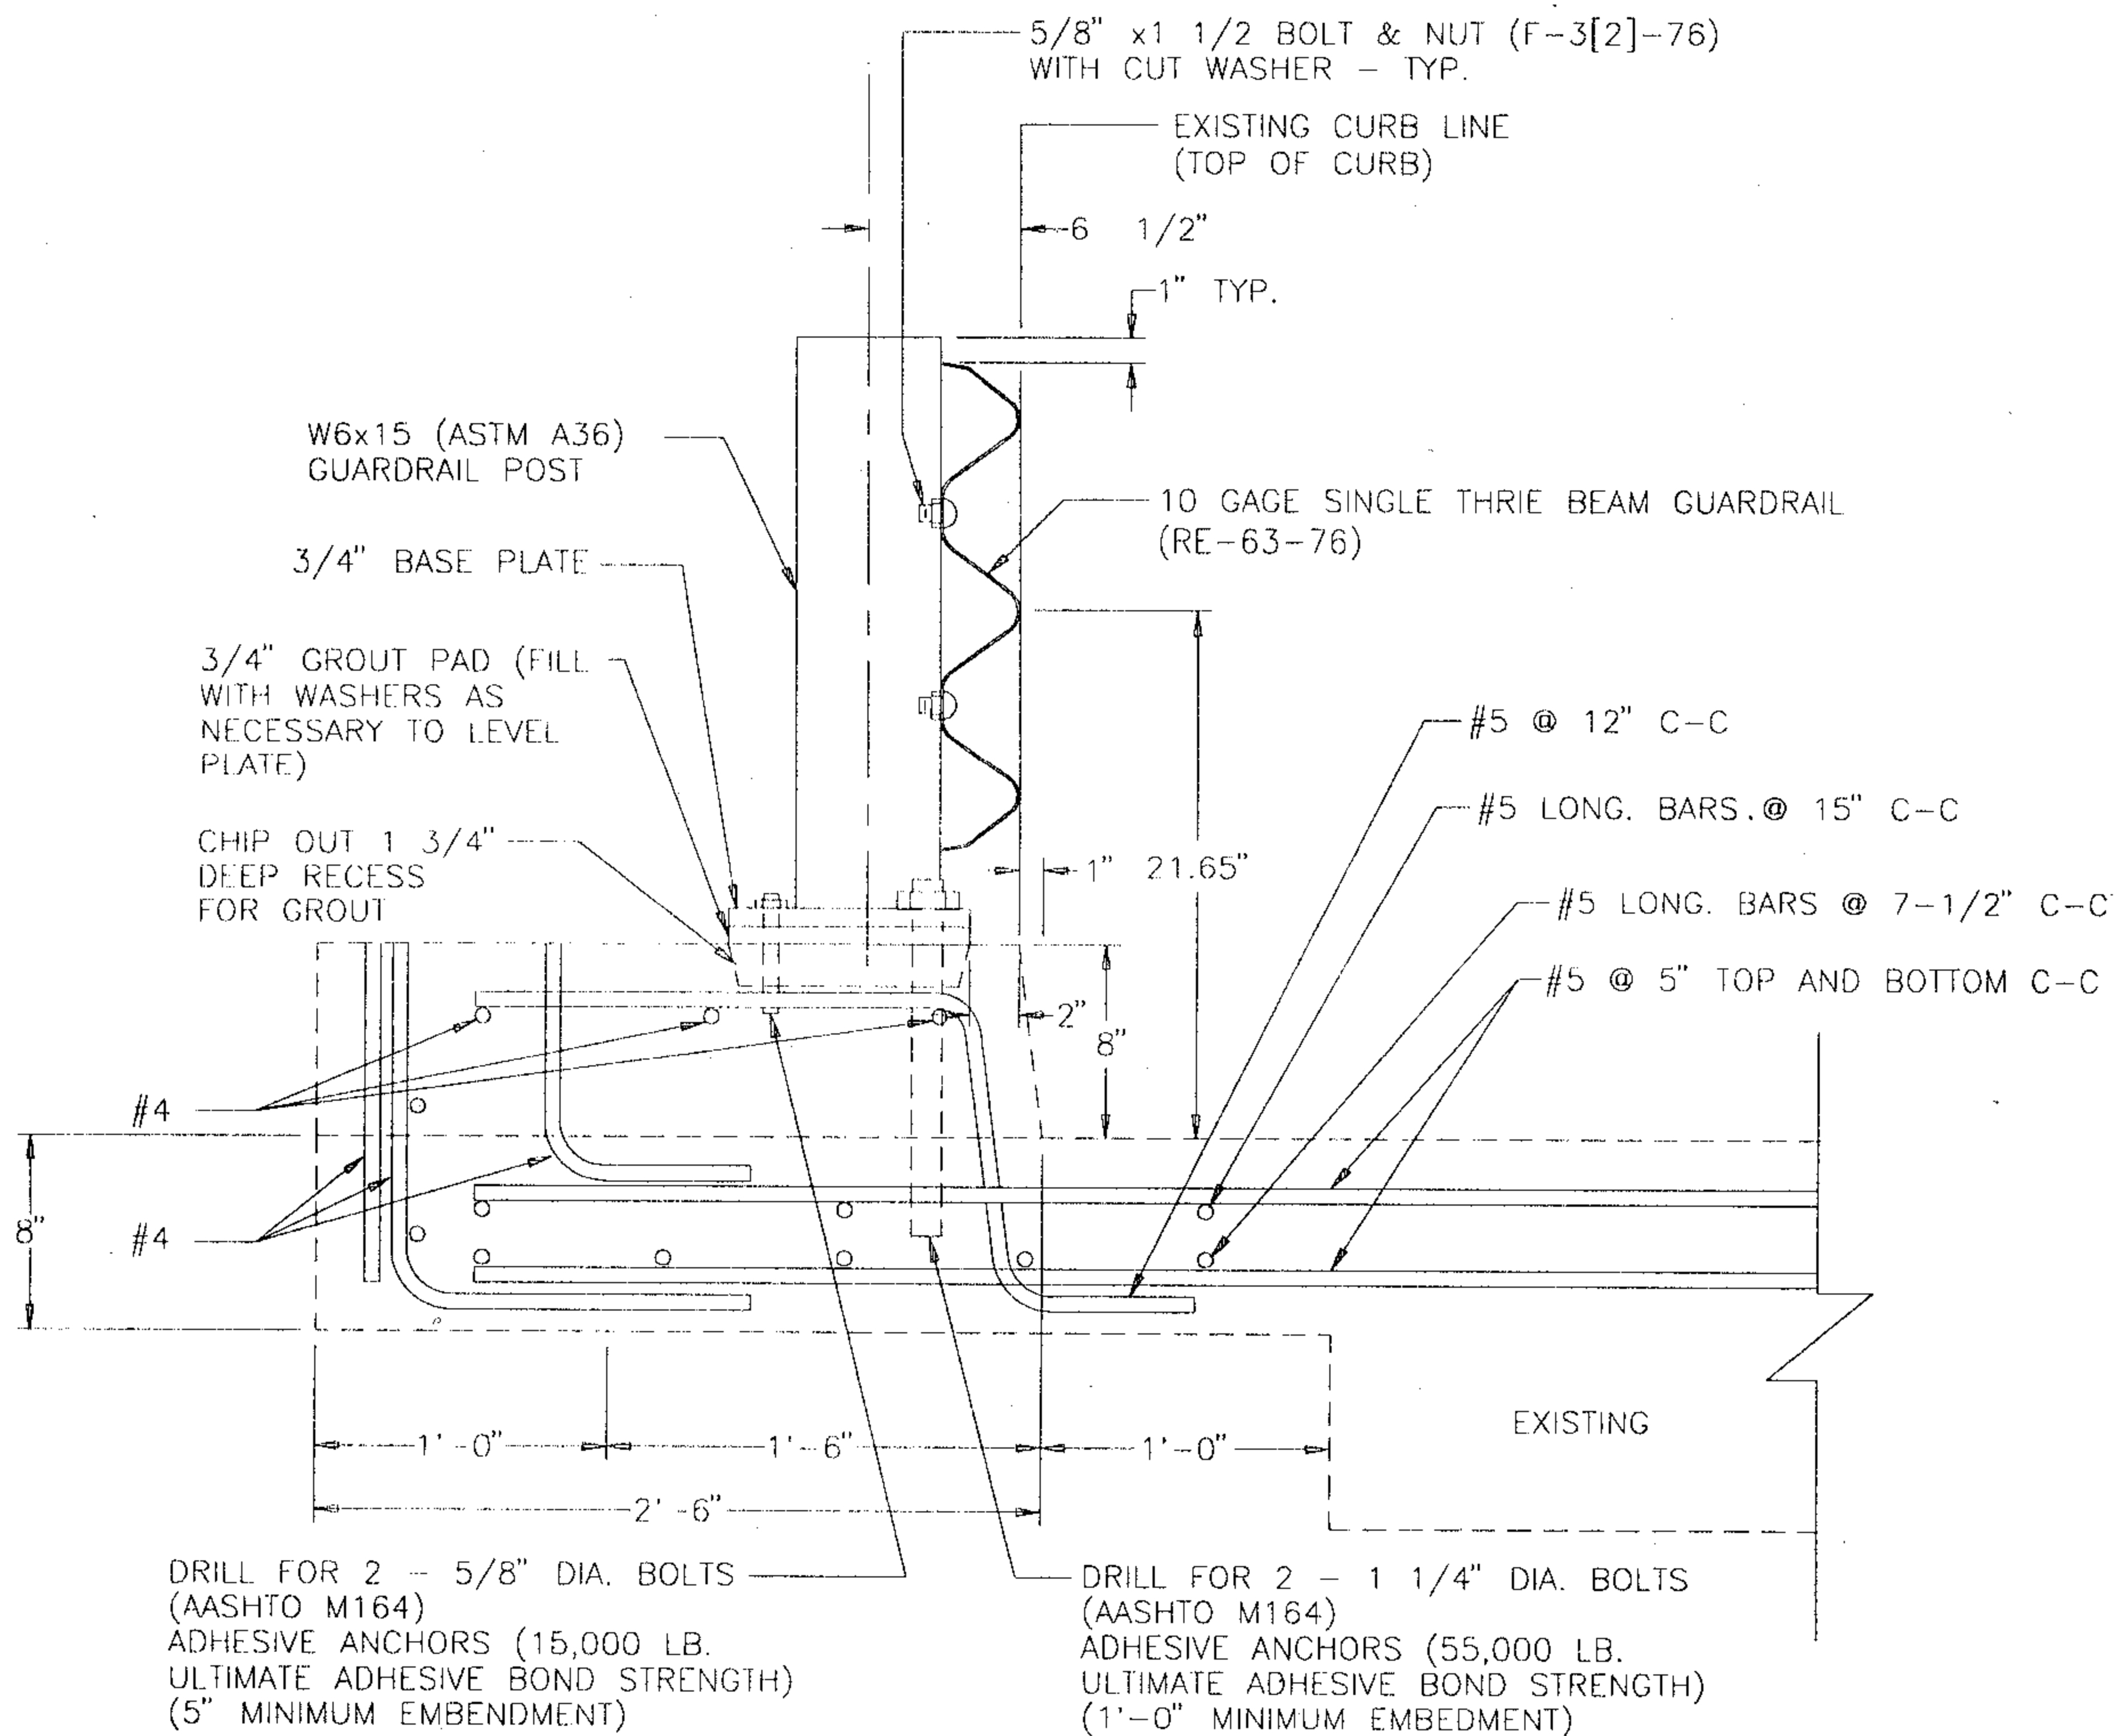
Michigan R4, 10-gauge Thrie Beam Retrofit on Curb / Sidewalk (16).
